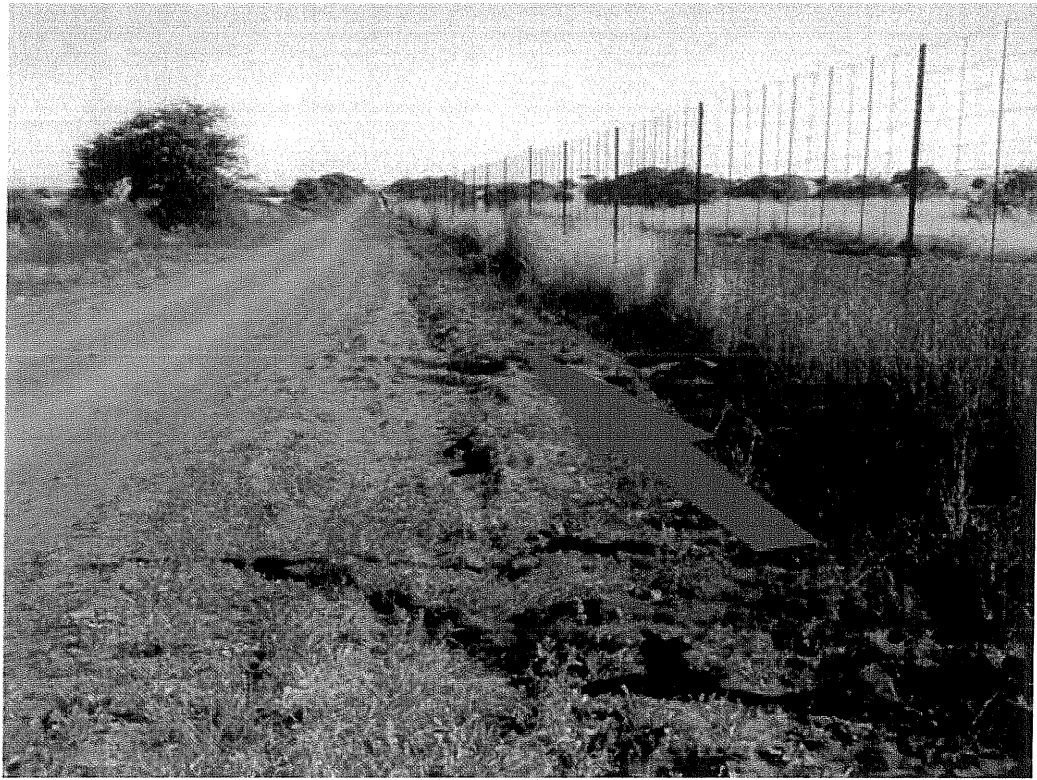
Section B to C. The pipeline will be placed alongside an existing farm road.
